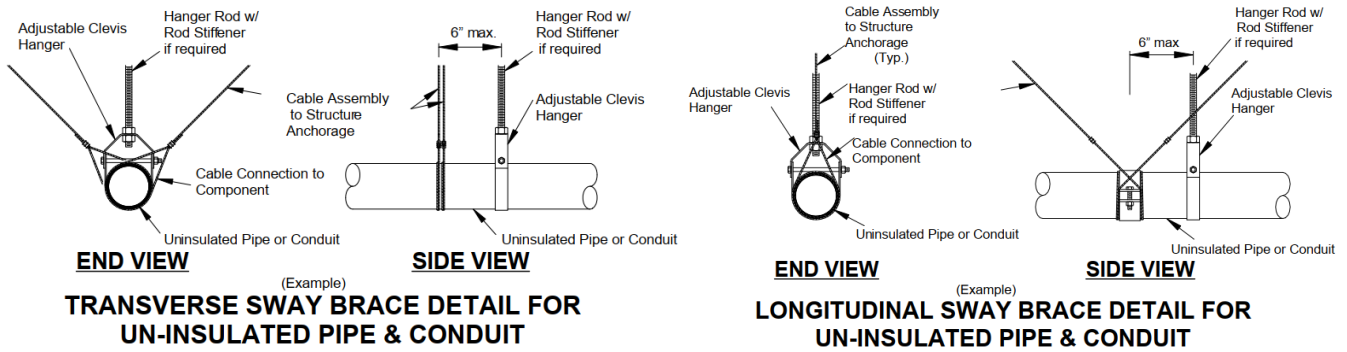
SWAY BRACE DETAILS FOR UN-INSULATED PIPE AND CONDUIT
